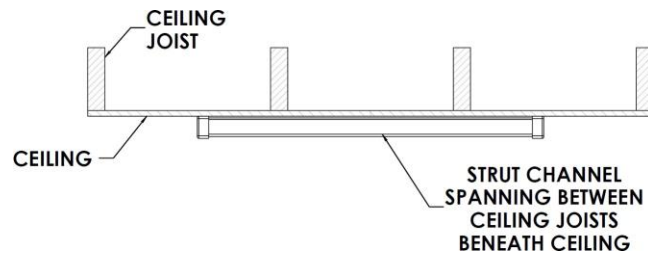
Strut Spanning the Centers of Two Wood Joists
